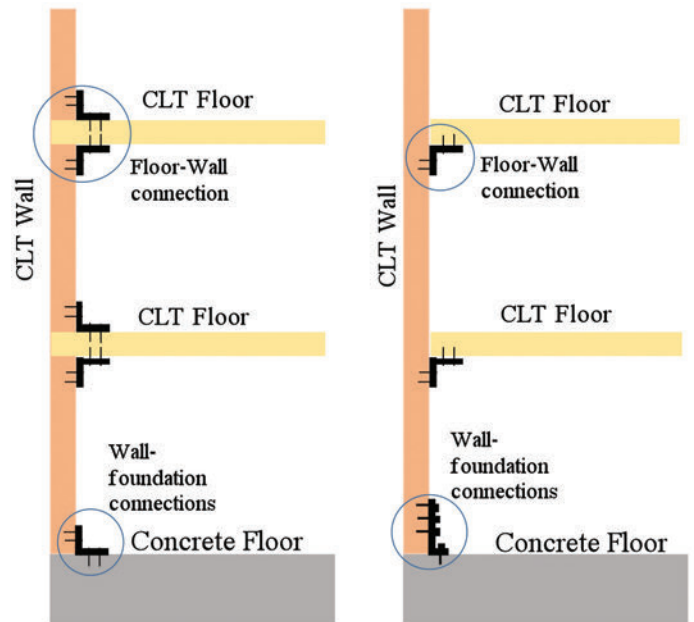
Platform type (left) and balloon type (right) CLT construction.
